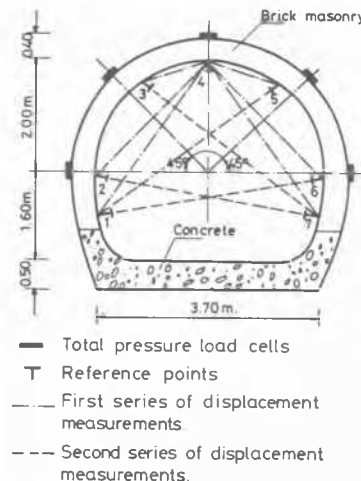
Experimental Tunnel. Cross Section (Uriel and Oteo, 1979).
